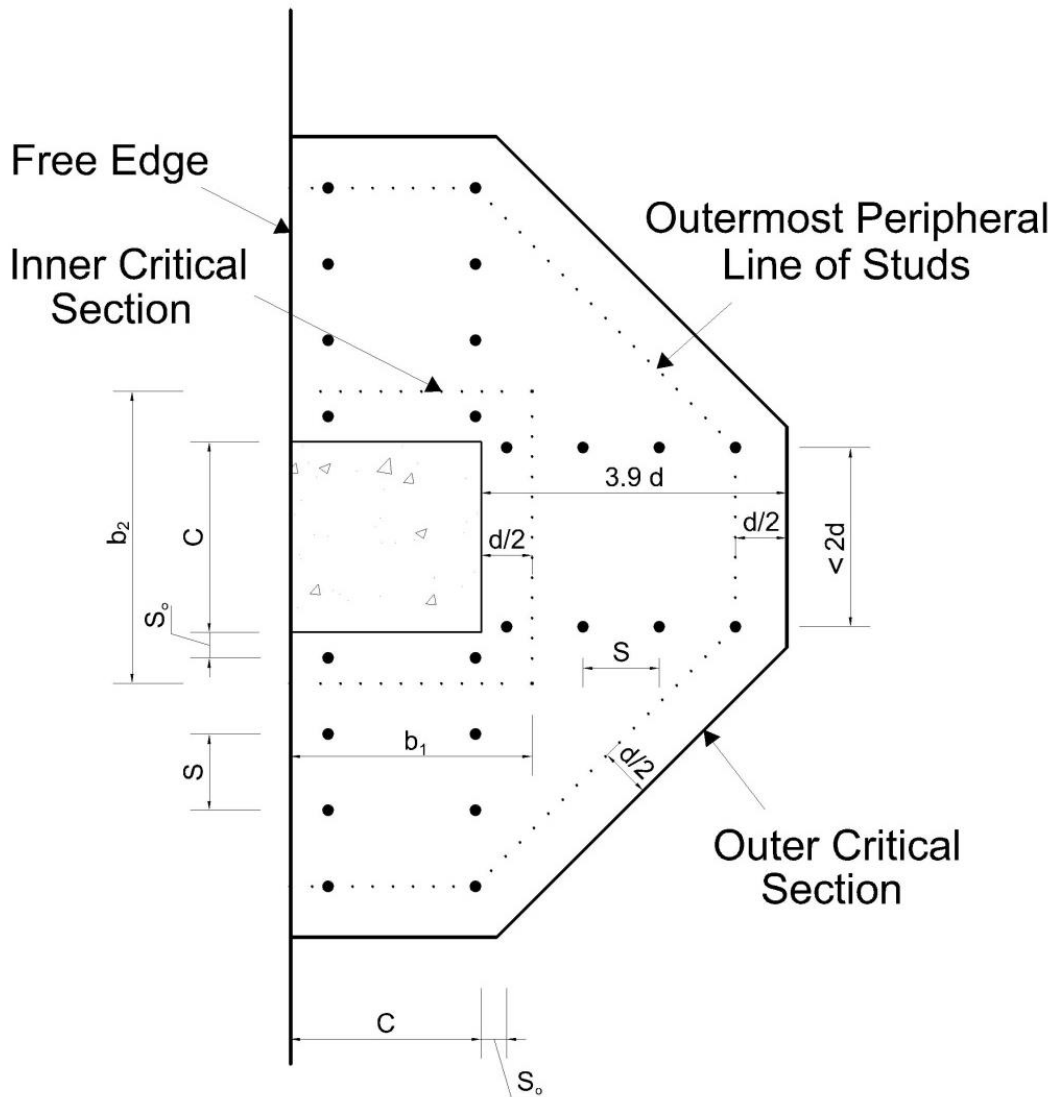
Typical Arrangement of Headed Shear Reinforcement and Critical Sections
